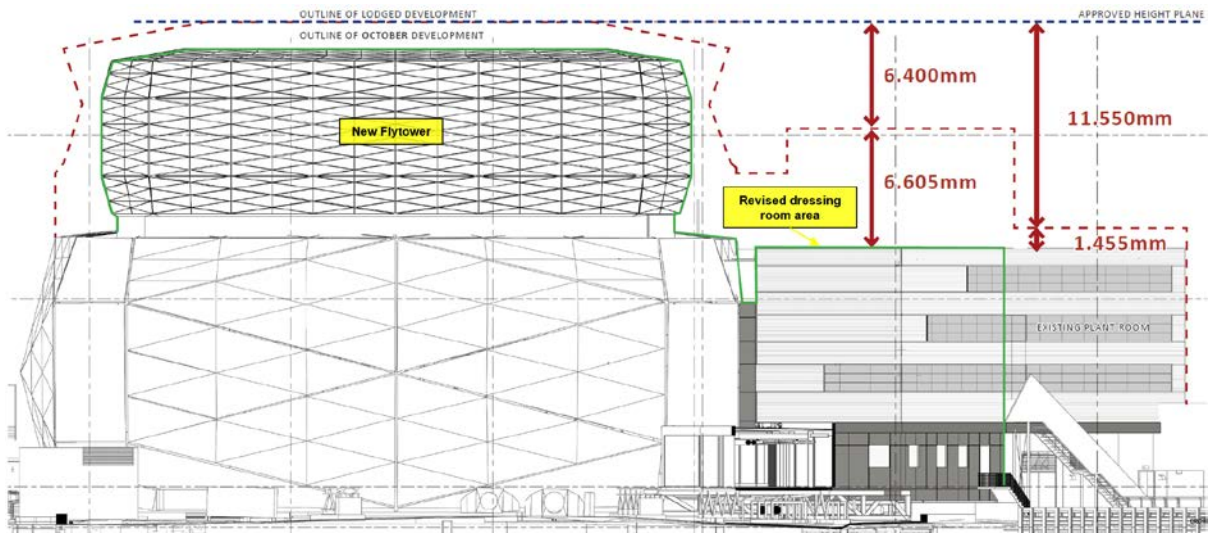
| North elevation of initially lodged (dashed outline) and amended proposal (Source: RtS)
